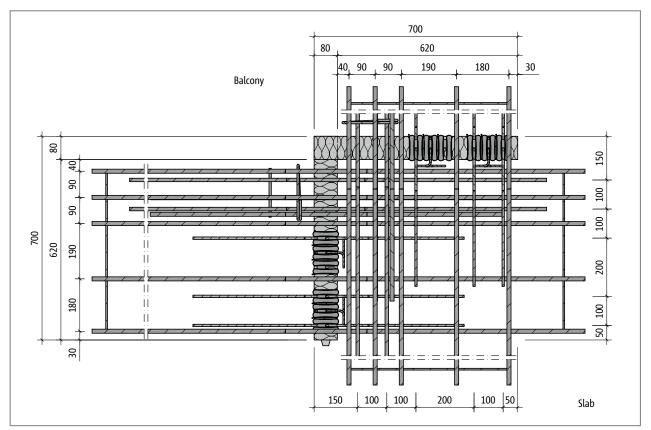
Schöck Isokorb® T type C-M3: Product layout
